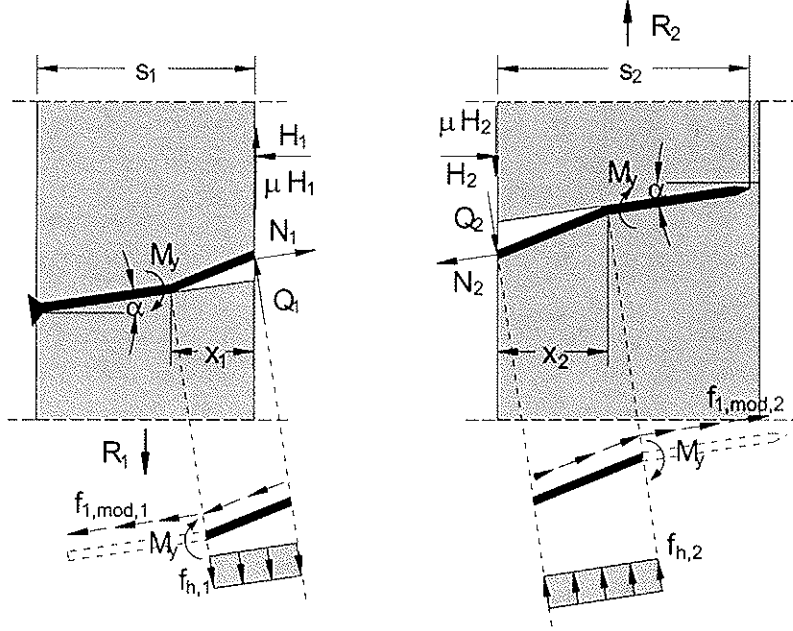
Forces and stresses in a timber-to-timer connection with an inclined screw for Johansen's failure mode 3
